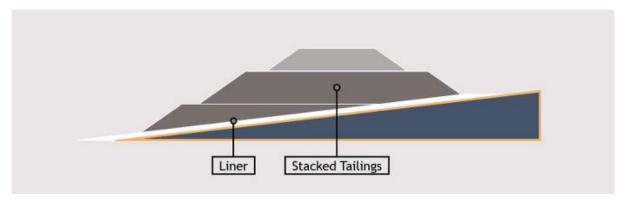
Filtered / Dry Stacking Tailing Storage Facility design (Yanama Gold, 2023)
